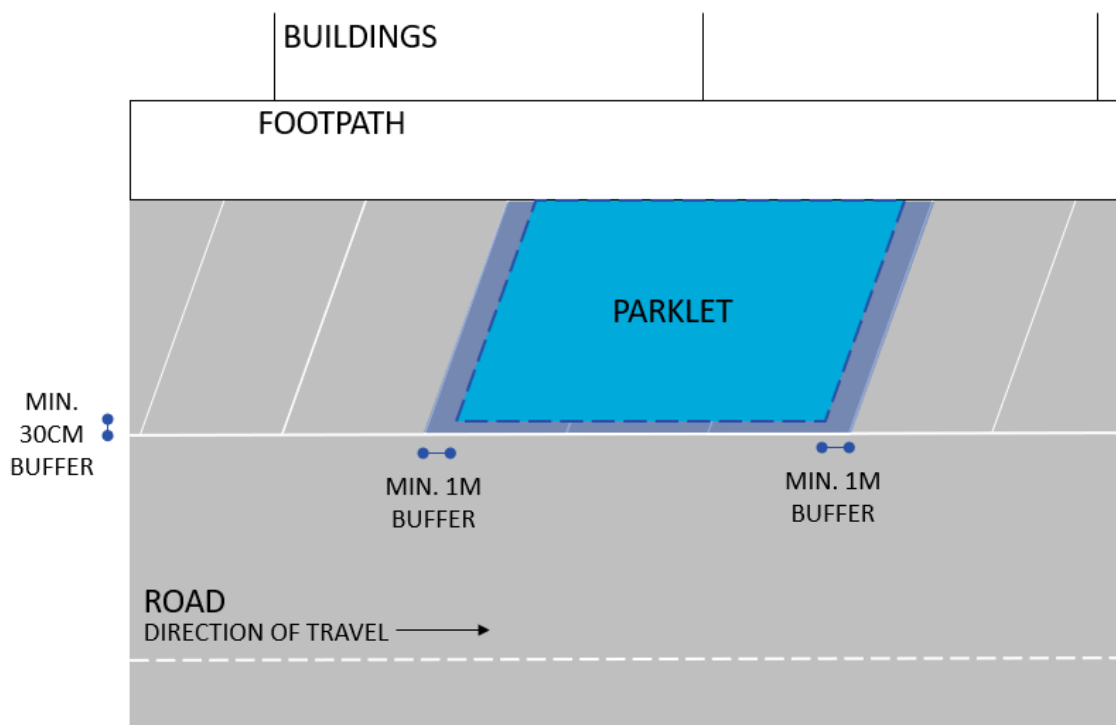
EDGE BUFFER FOR ANGLED PARKING SPACES
